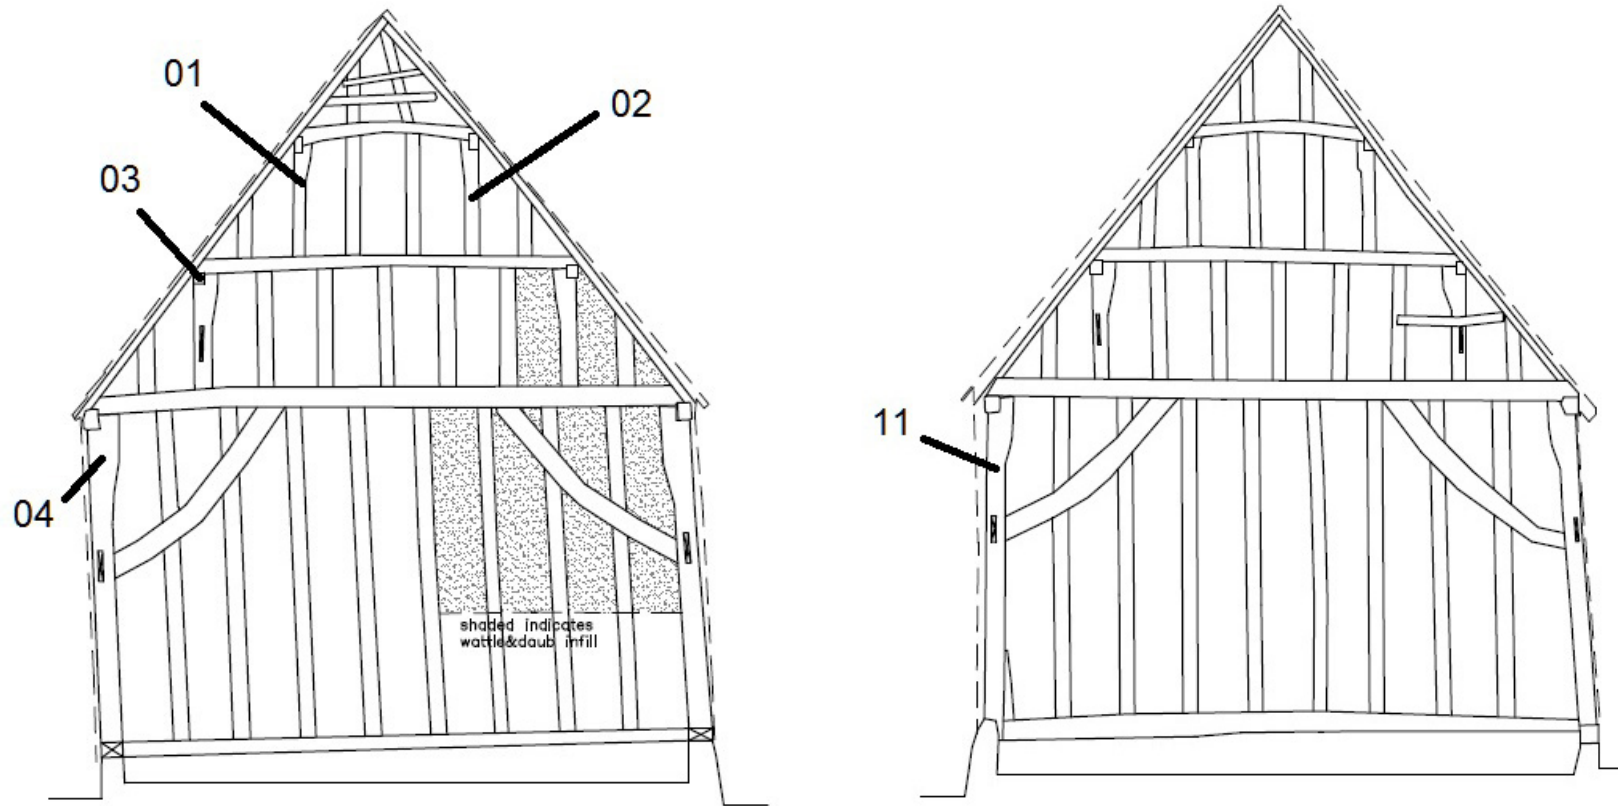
Drawings of the north wall (left) and south wall (right) showing timbers sampled for dendrochronology (adapted from original drawings supplied by Stuart Armitage, Morton Partnership)
